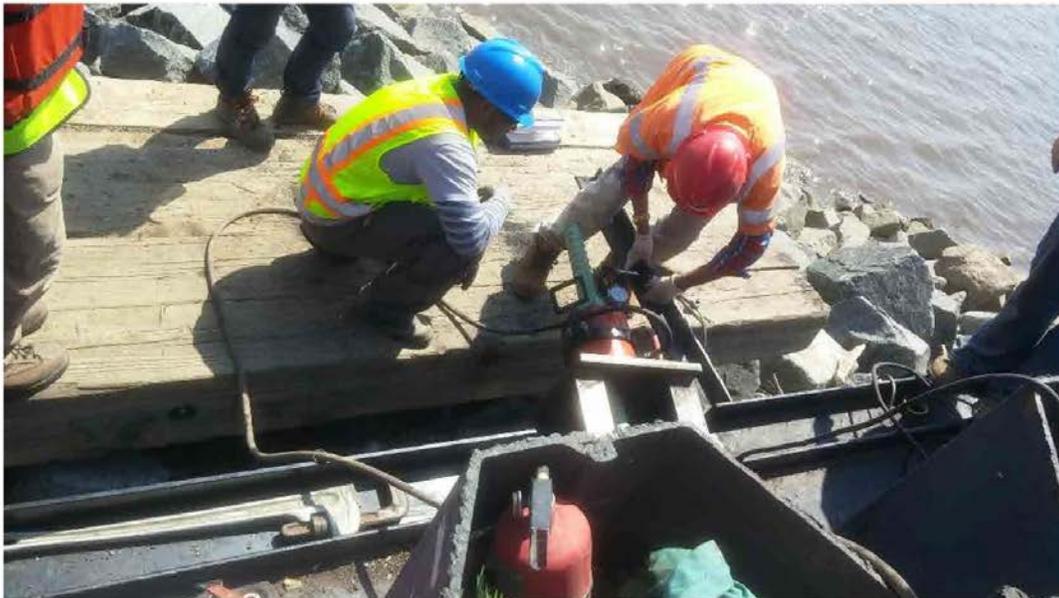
Contractors performing tie-rod stress tests, facing southeast.
